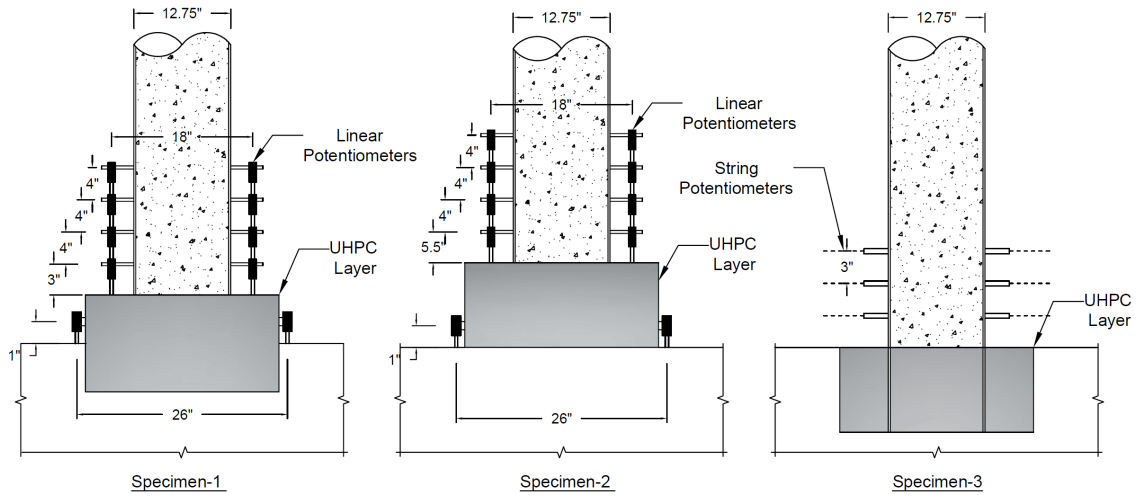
Instrumentation detail for specimen-1, 2 and 3.
